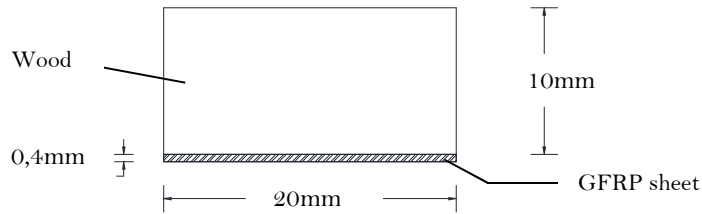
Cross section dimensions of a GFRP reinforced wood beam
